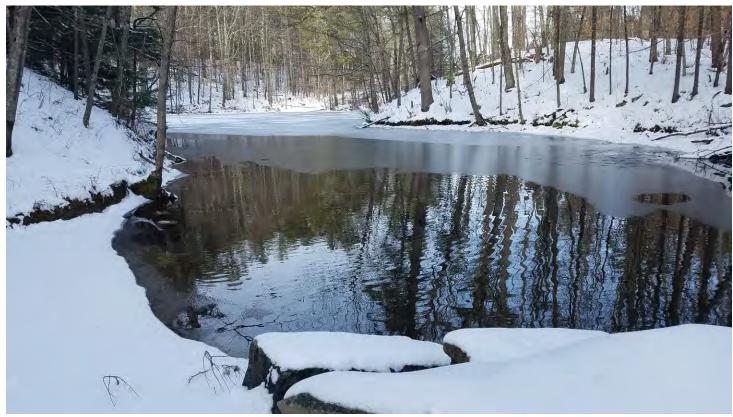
RESERVOIR UPSTREAM OF CONCRETE BLOCK STRUCTURE.
